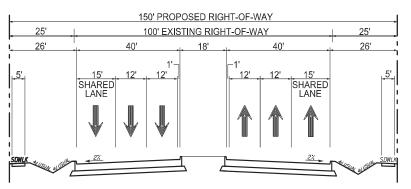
TxDOT Schematic Typical Roadway Cross Section
